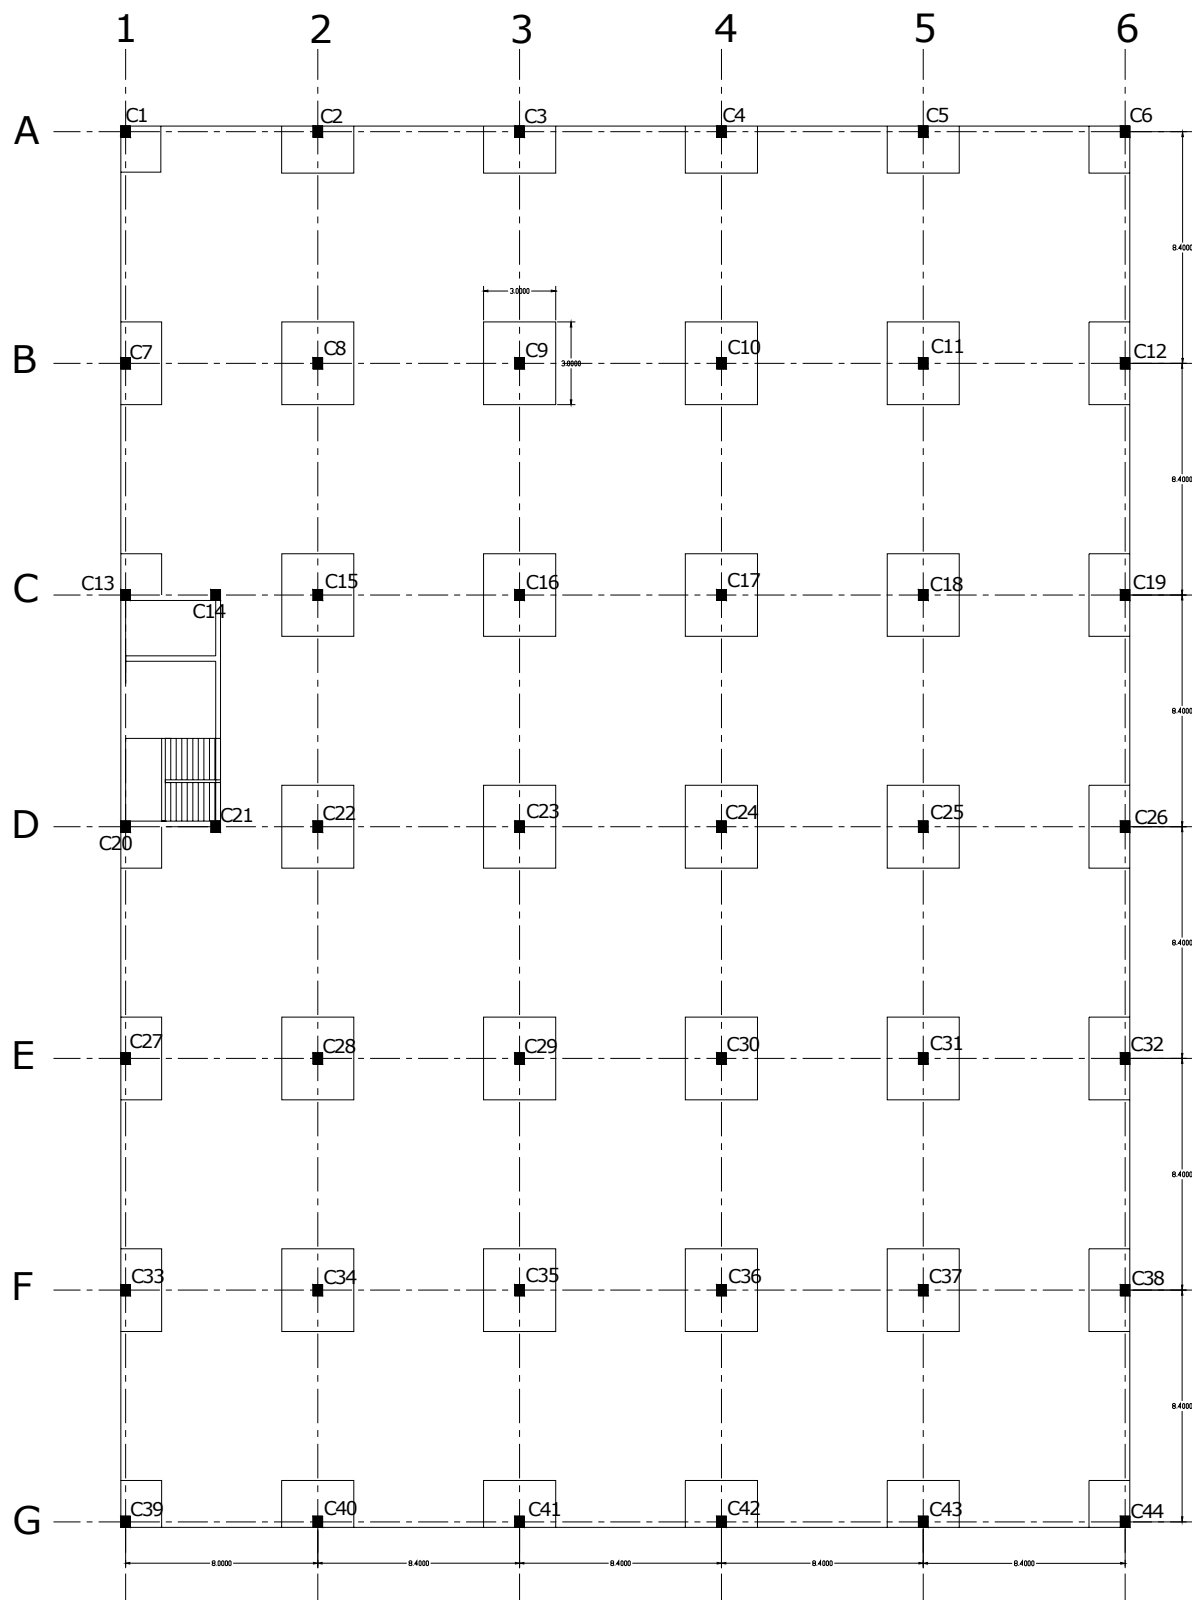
Floor system for the Post-tensioned flat slab and Reinforced concrete flat slab
